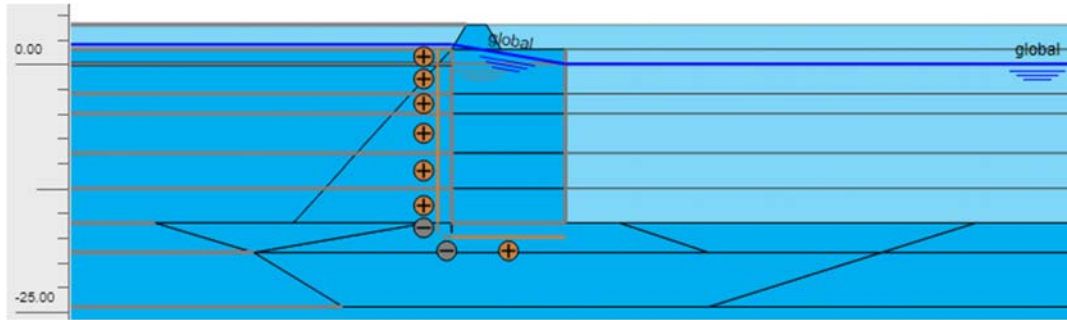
Hydraulic conditions, water level in hydraulic fill at elevation +1.5 m.
